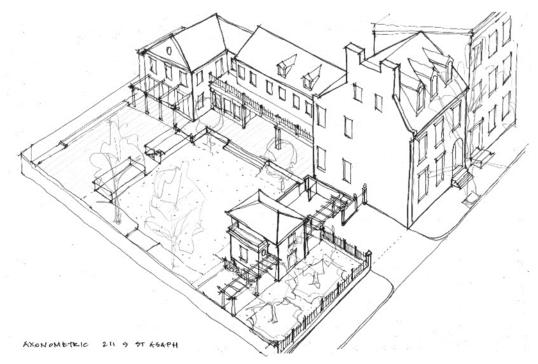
Two story pavilion and addition to the rear of the ell at 211 S Saint Asaph Street approved by the BAR in 2017.
